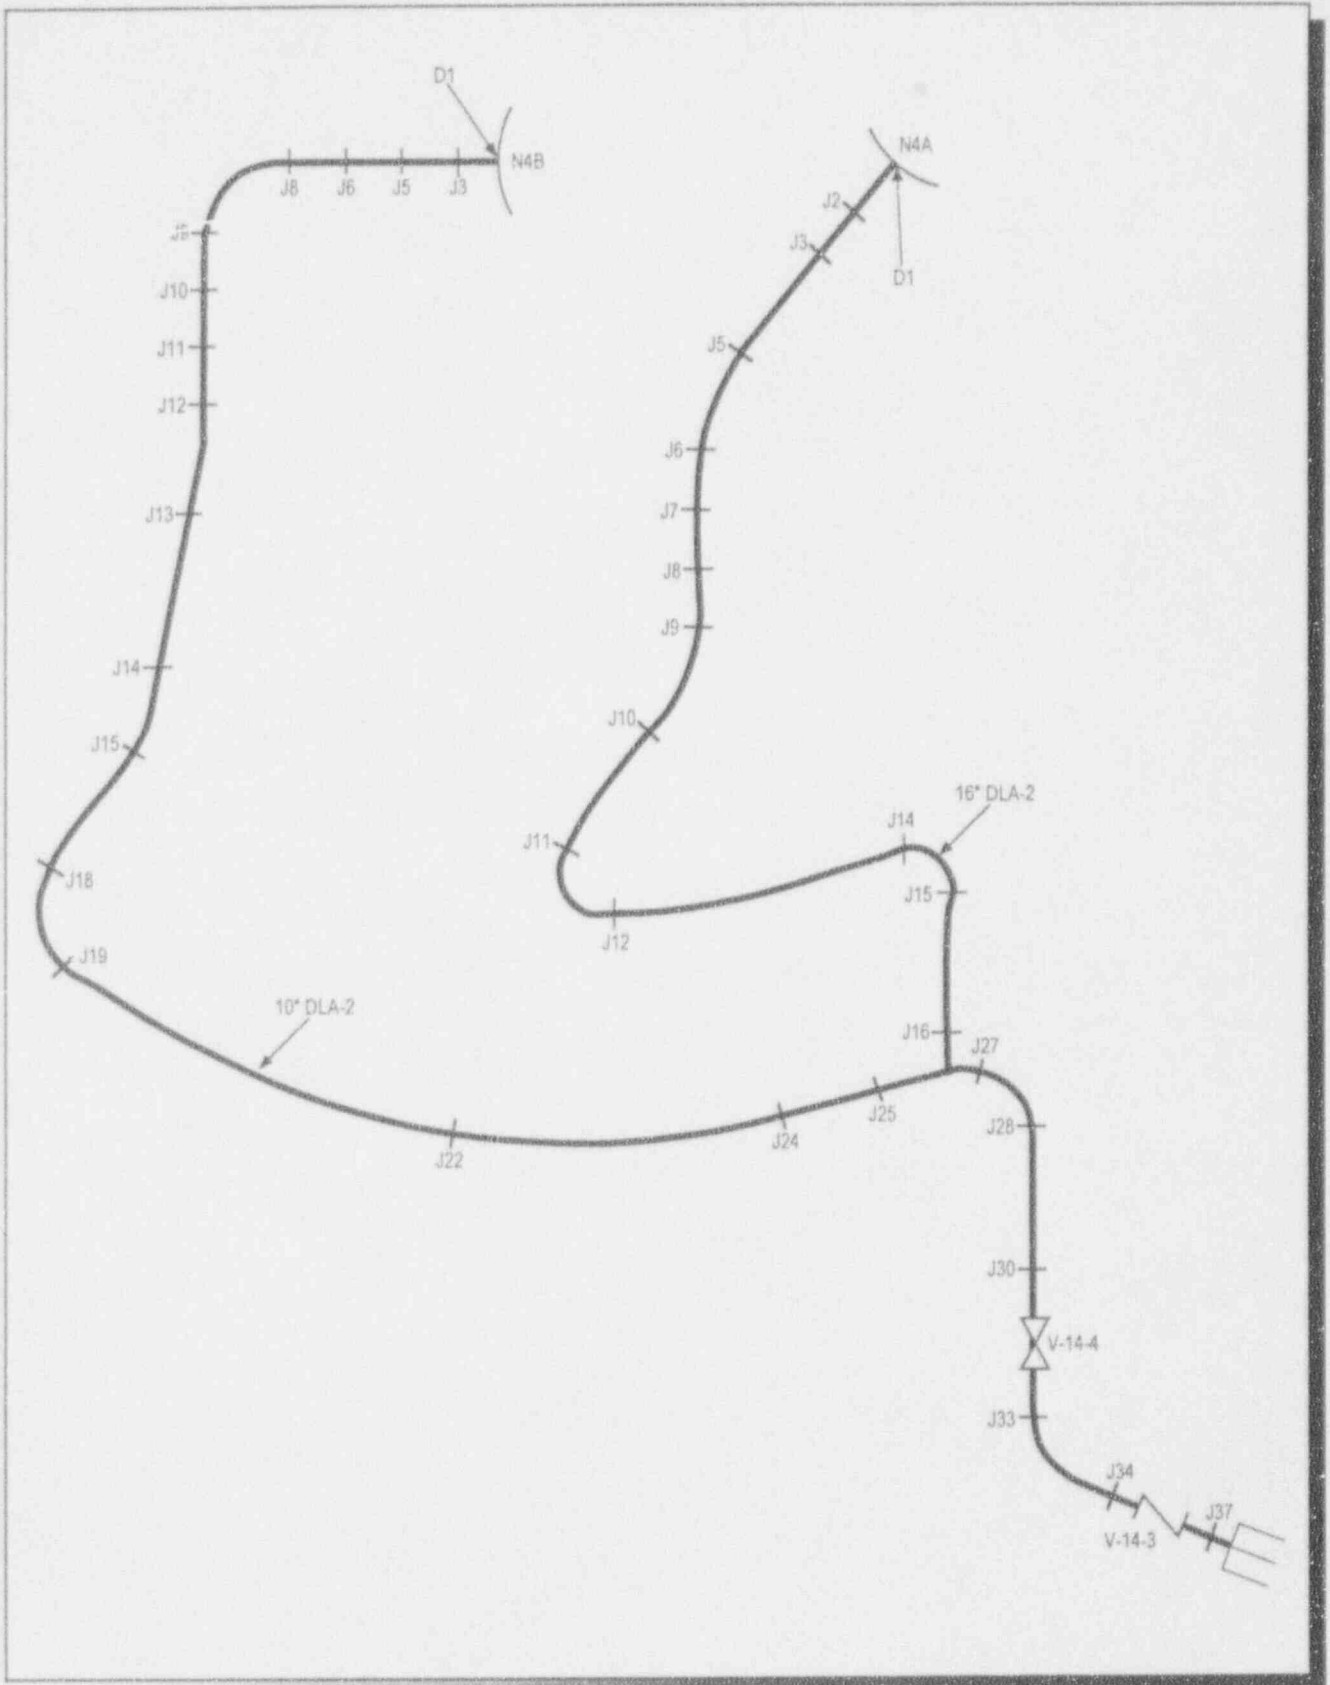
Isometric Drawing of Welds in Feedwater Loops A & B
